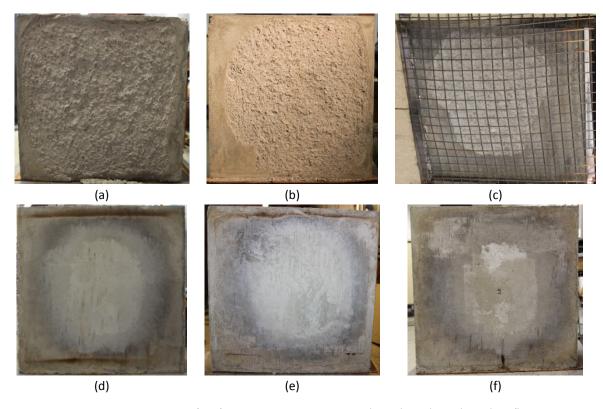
Specimens after fire-induced spalling tests. a) P1 b) P2 c) P3 d) F1 e) F2 f) F3
